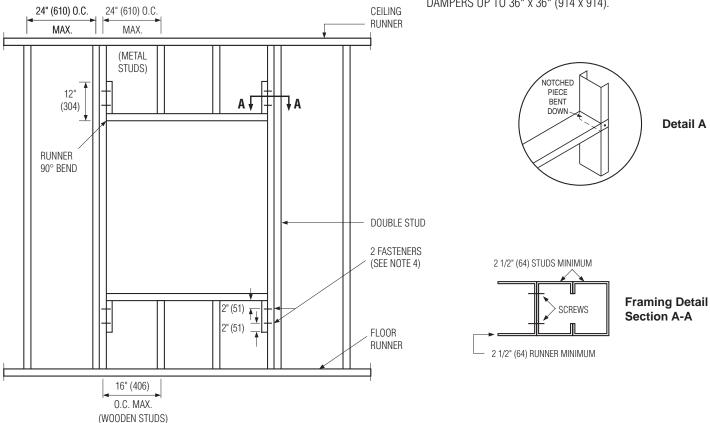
DOUBLE VERTICAL STUD OPENING PREPARATION DETAILS.
